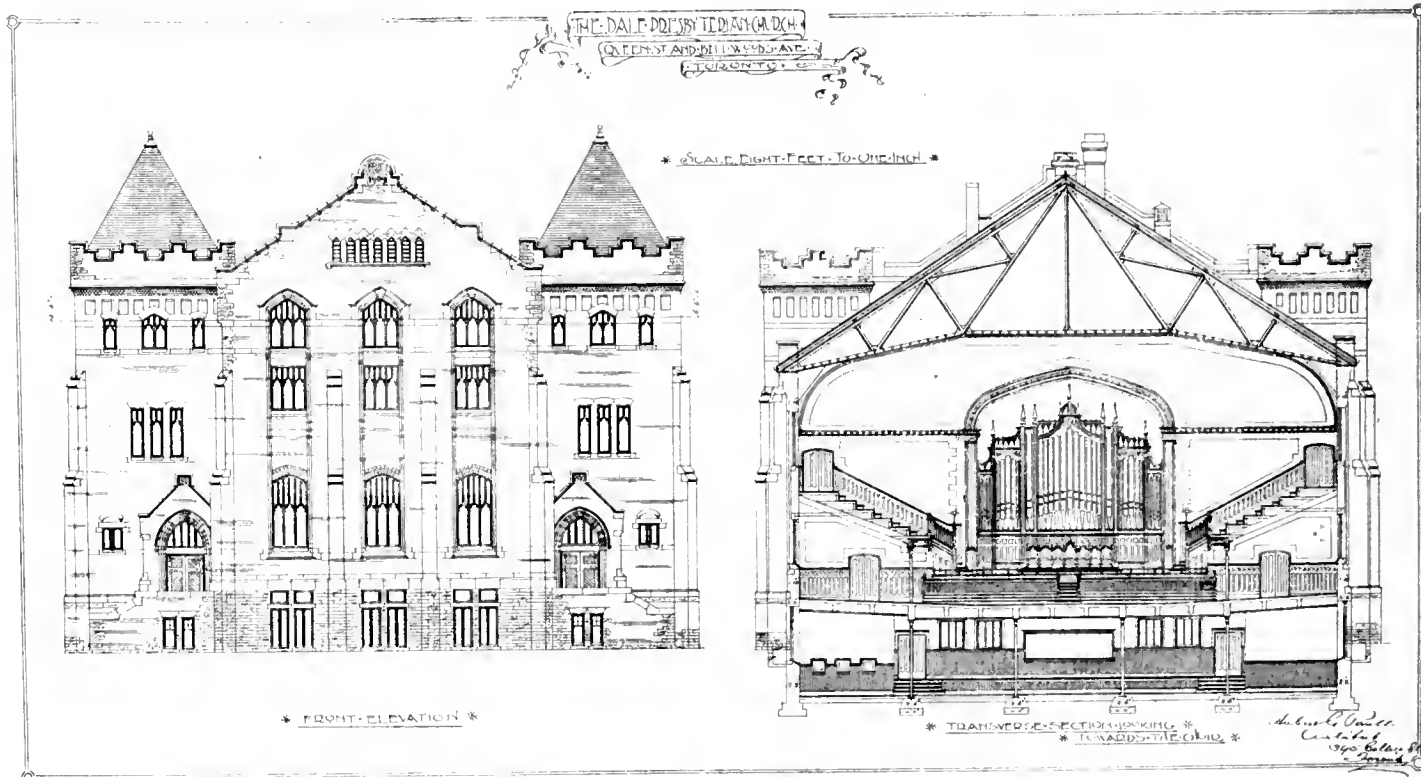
Queen Street Elevation and Section, showing choir and organ lofts, also section of roof-span.
